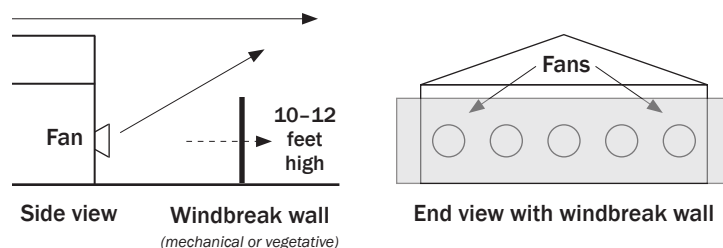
Example layout of a windbreak wall for a typical tunnel ventilated building. Windbreak walls should be placed at minimum four fan diameters downwind from the fans.
